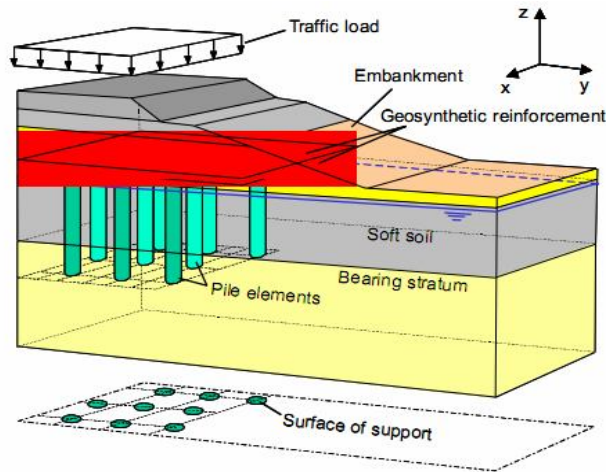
Geosynthetic reinforced pile supported embankment [4],[5]
